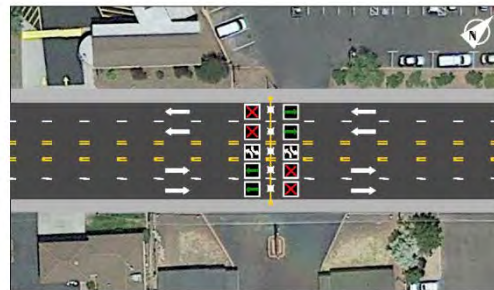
Milton Road System Alternative 2 Plan View: Reversible Center Lane
